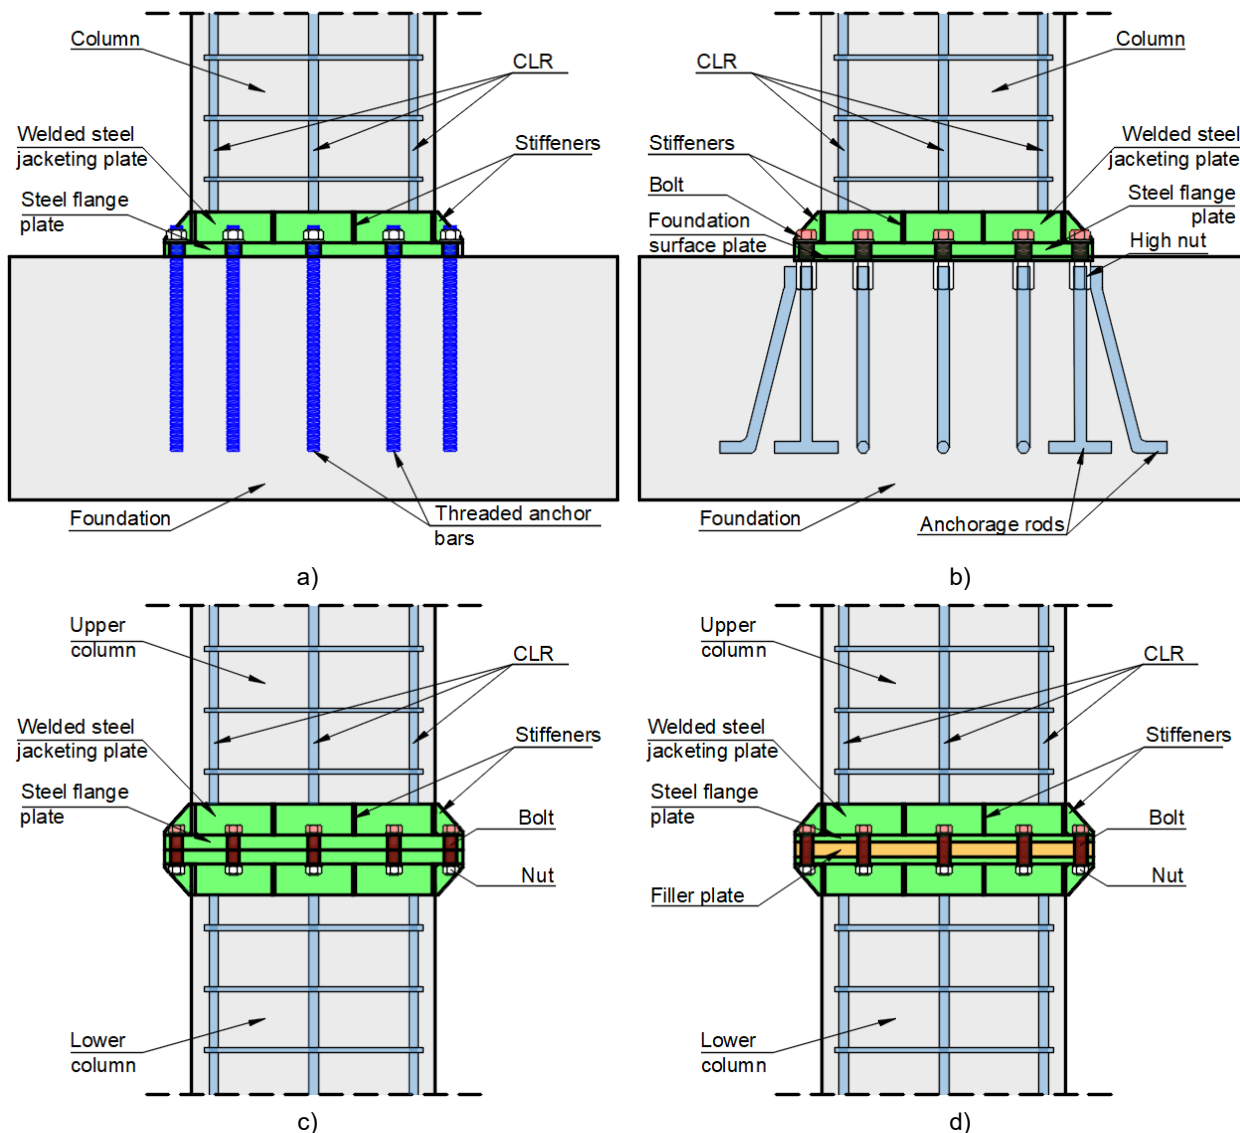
Typical configuration of steel flange plate connections: a) CF connection, b) CF connection adapted from Pul et al. [55], c) CC connection, d) CC connection with filler plate
